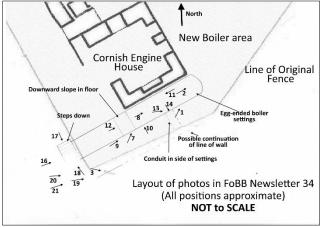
Layout of photos 1-3, 7-14, 16-21
